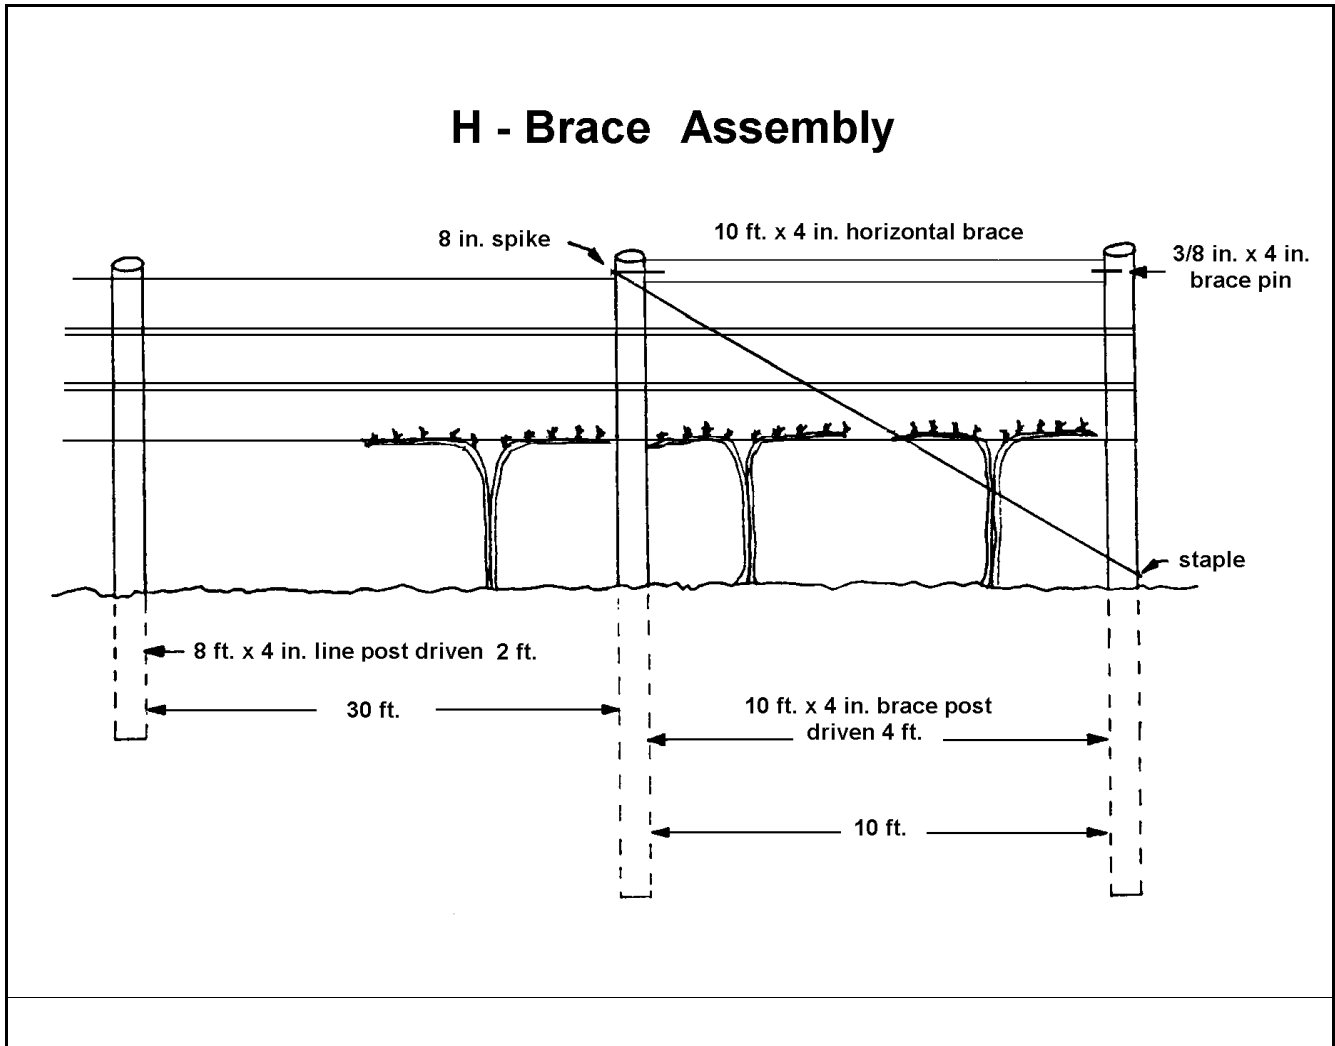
"H-Brace" trellis brace assembly. Vine planting within the end brace assembly is possible.
